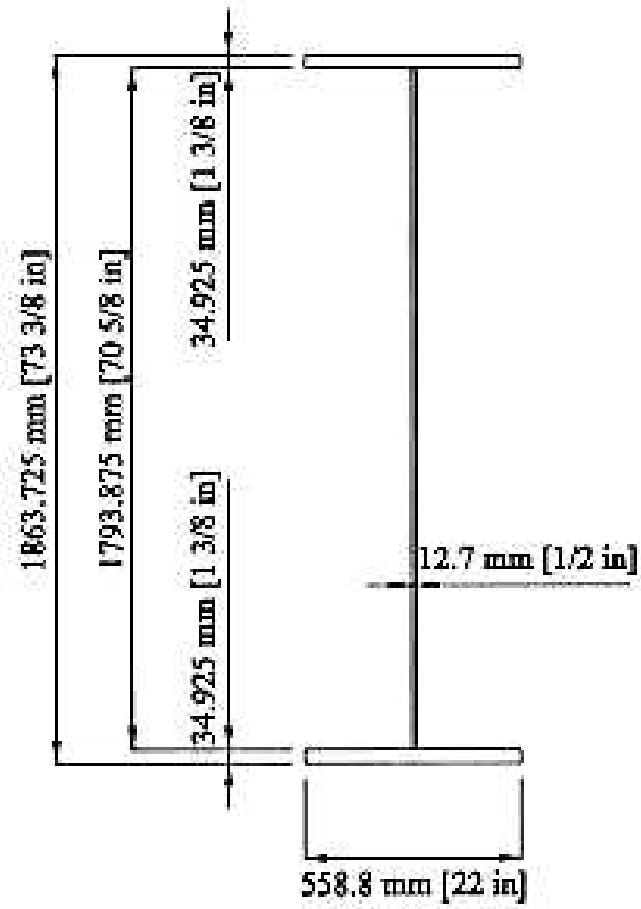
Sketch of girder cross section at brittle fracture location
